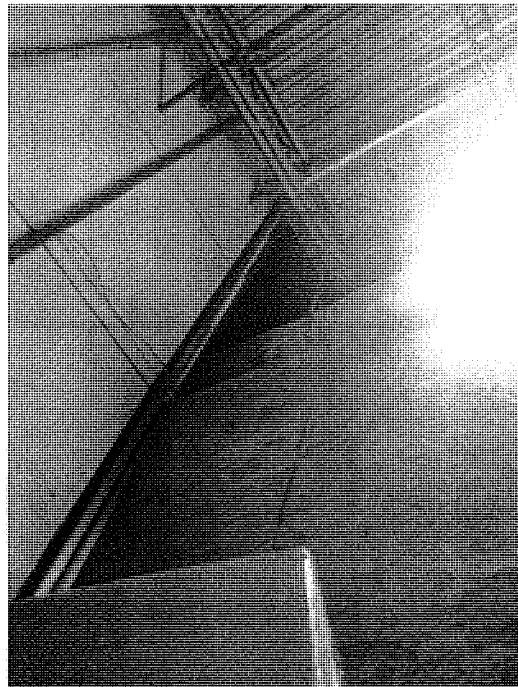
View of wallboard, plenum and air duct from inside Utility Area.
